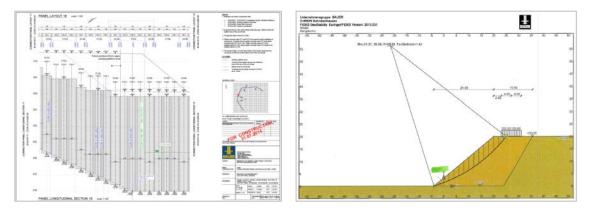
Top of COW (cut-off level) and stability design for elevation changes Central Part to Banks
